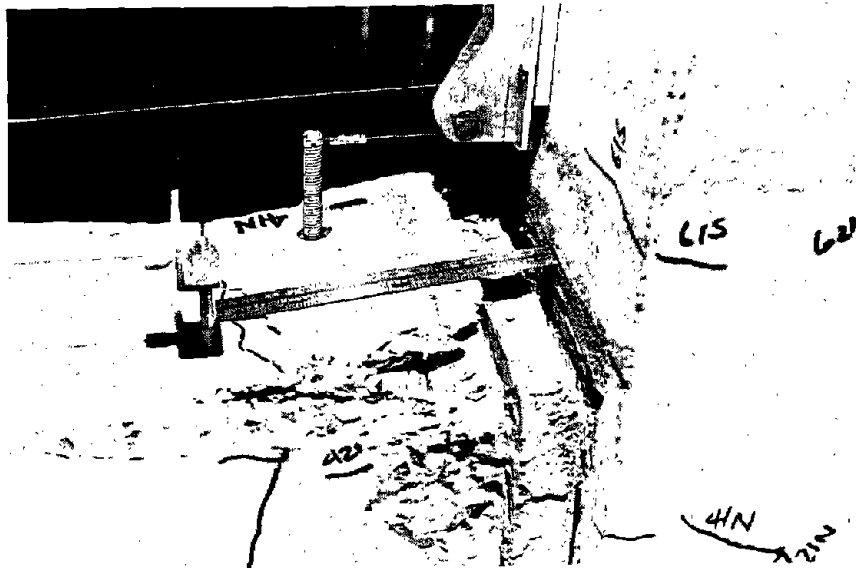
Beam damage at $8 \Delta_y$ - C-P-Z4.
